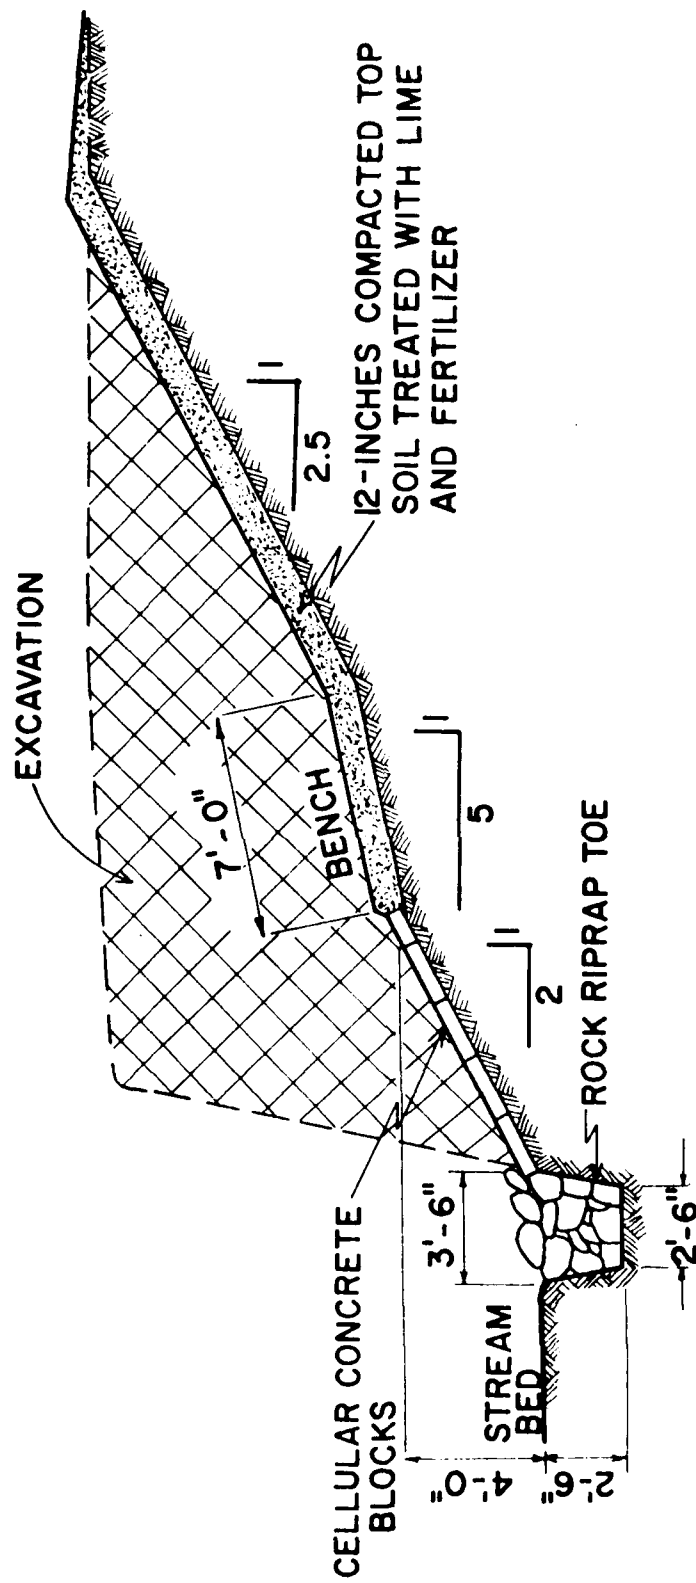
Johnson Creek Study Reach No. 3 - Excavated Bench Section with Lower Bank and Entrenched Toe
